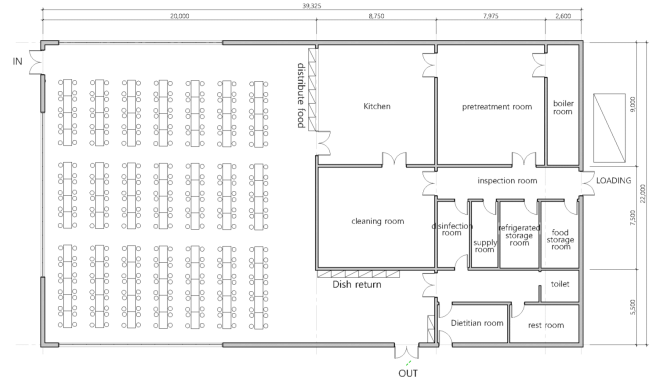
School cafeteria plan under the normal situation (unit:mm)
